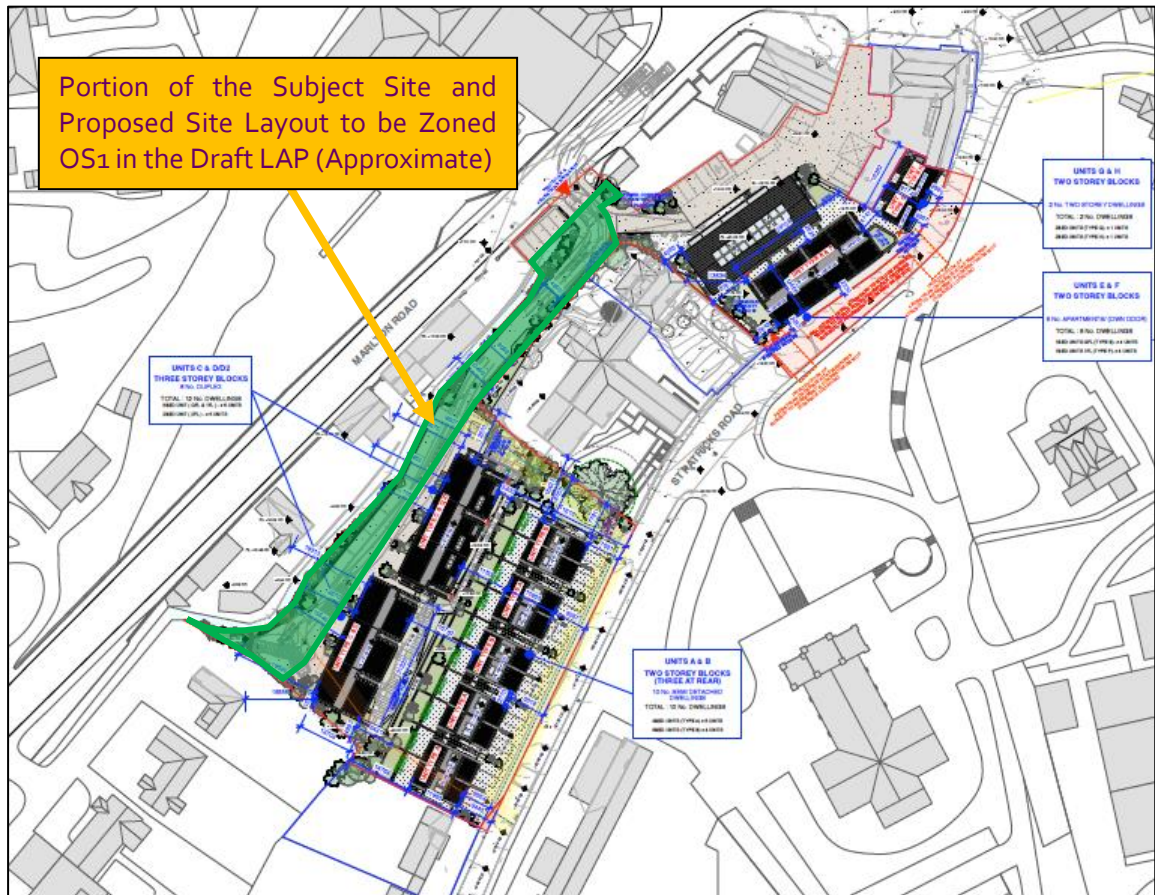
Portion of the subject site and site layout which the Draft LAP proposes to zoned as OS1
